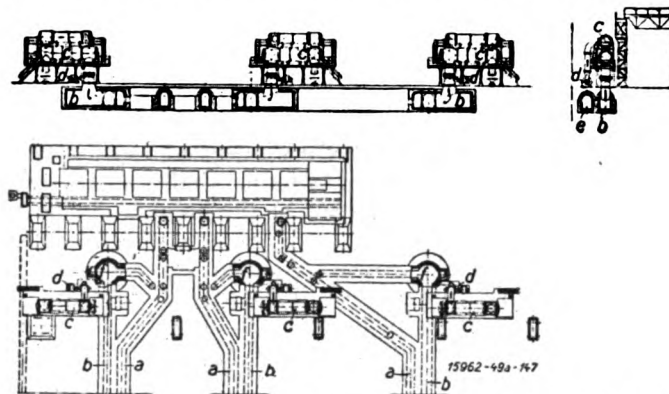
Section of an open-hearth steel shop with six waste-heat boilers working in conjunction with 40 and 80-ton open-hearth furnaces. a = gas flue, b = waste gas channel, c = waste-heat boiler, d = electric fan, e = flue, f = chimney.
